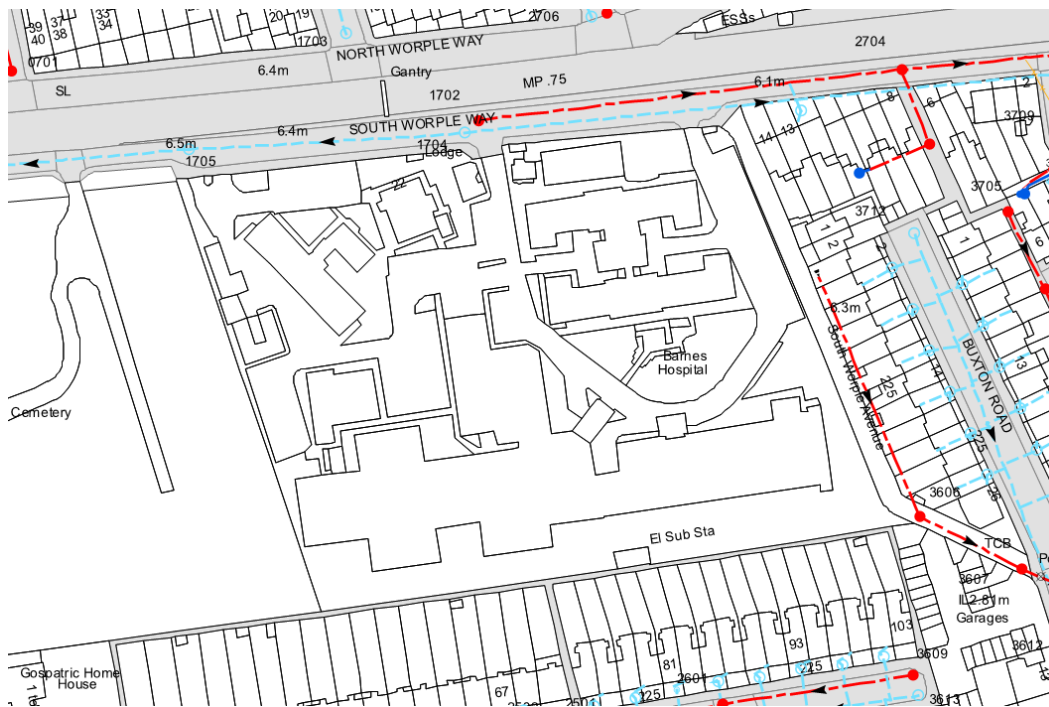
Existing drainage around Barnes hospital site (from Thames Water (TWUL) Asset Location Search (ALS))
